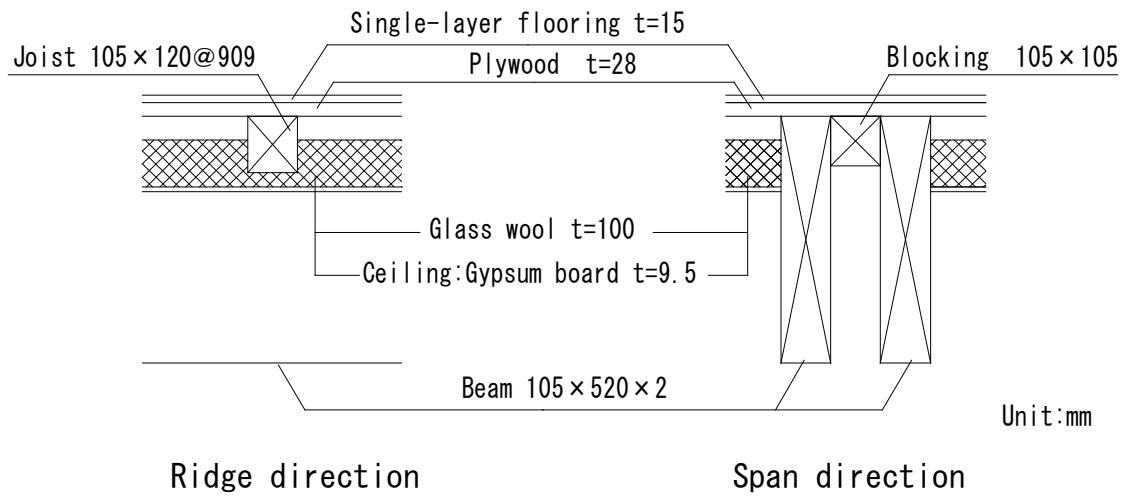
Upstairs floor cross-sectional diagram of elementary school D.
